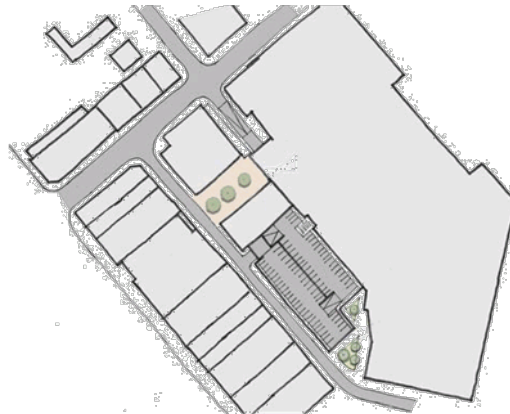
plan of preferred off street car parking locations in Precinct 6
